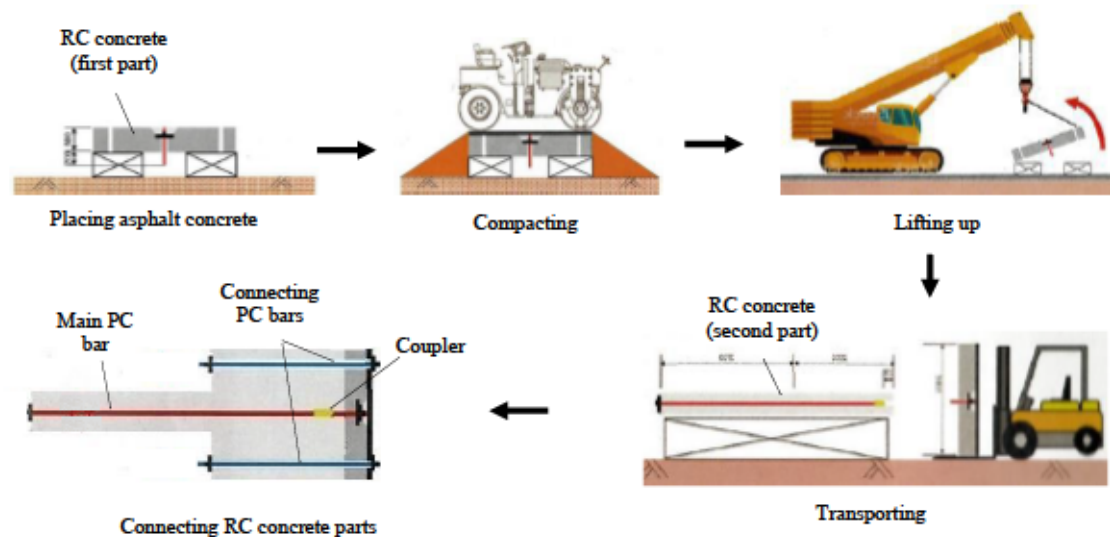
Fabrication of the specimen with 80 mm thick asphalt pavement [1]
